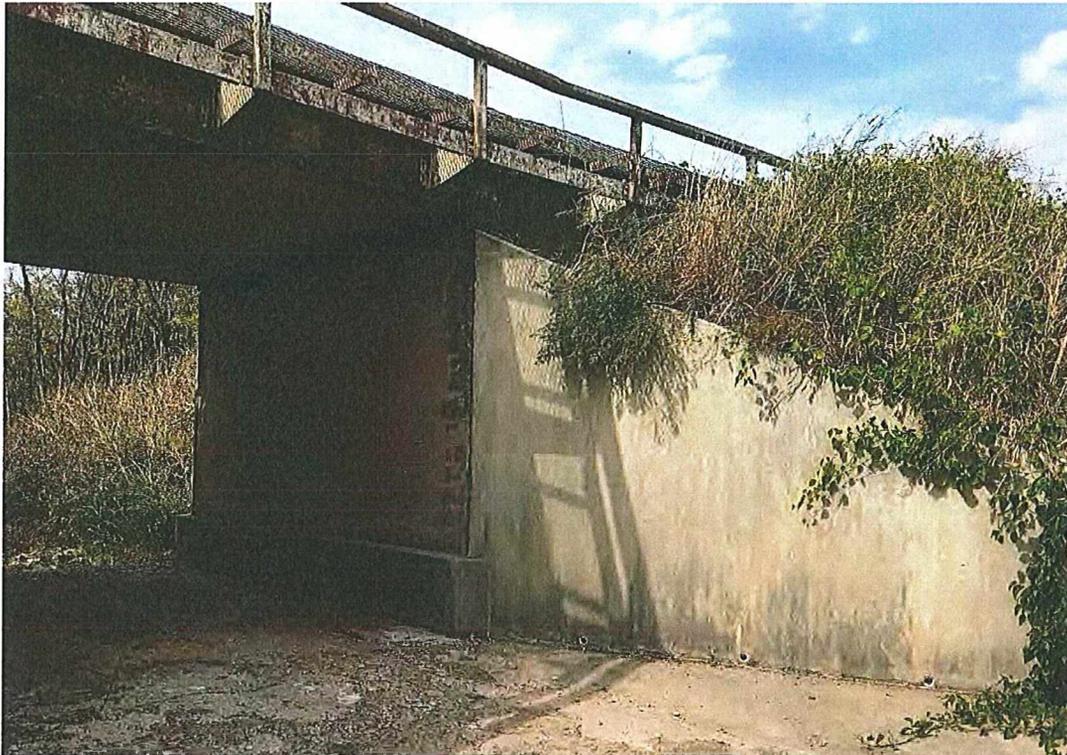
(top photo) is looking at the north abutment wall and the northeast wingwall. The original northeast wingwall is located behind the visible wing and under the bridge railing.
